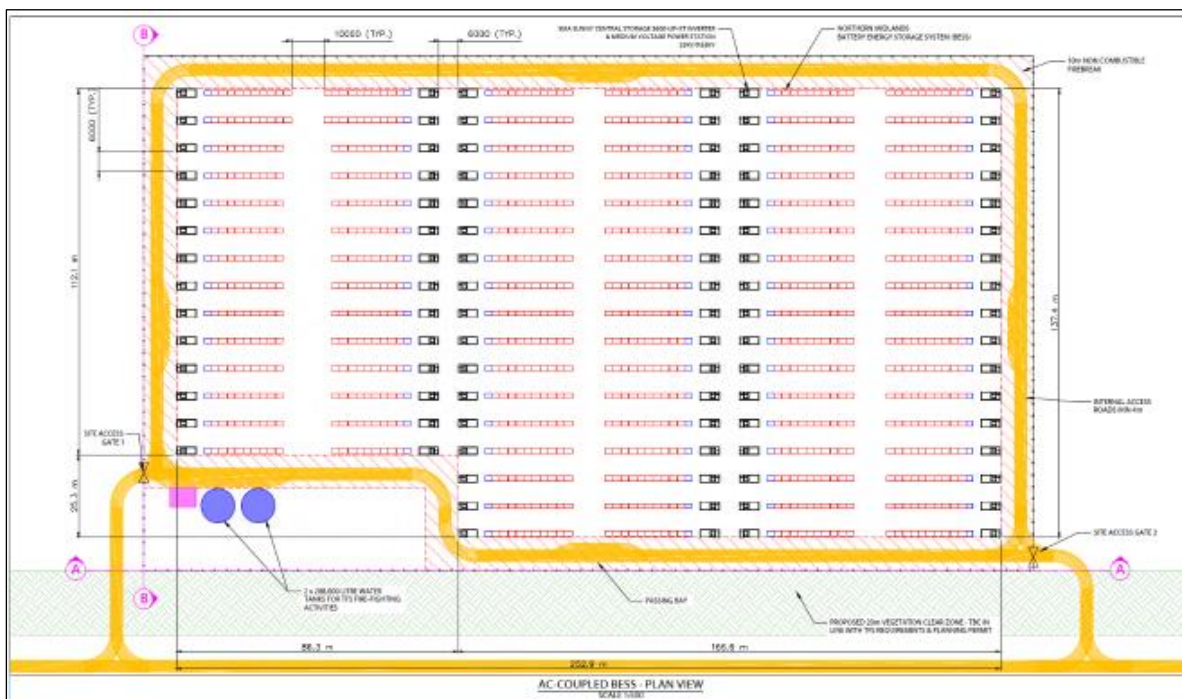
Proposed BESS layout (site plan) (source: Cogency ibid)
